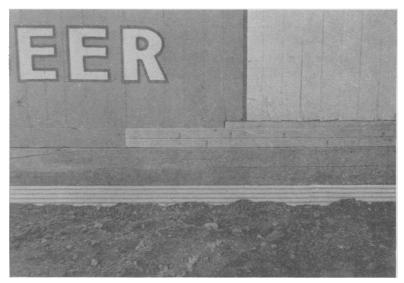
Another view of the building in FIGURE 3. A trench 2 feet deep has been dug around the building and a wall of galvanized iron roofing installed 2 feet below the ground level and several inches above. The top edge has been firmly nailed to the building.
